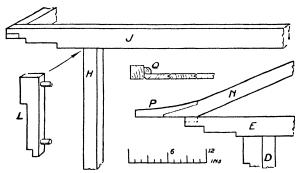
Front Beam, Bracket, Rafter, etc.
